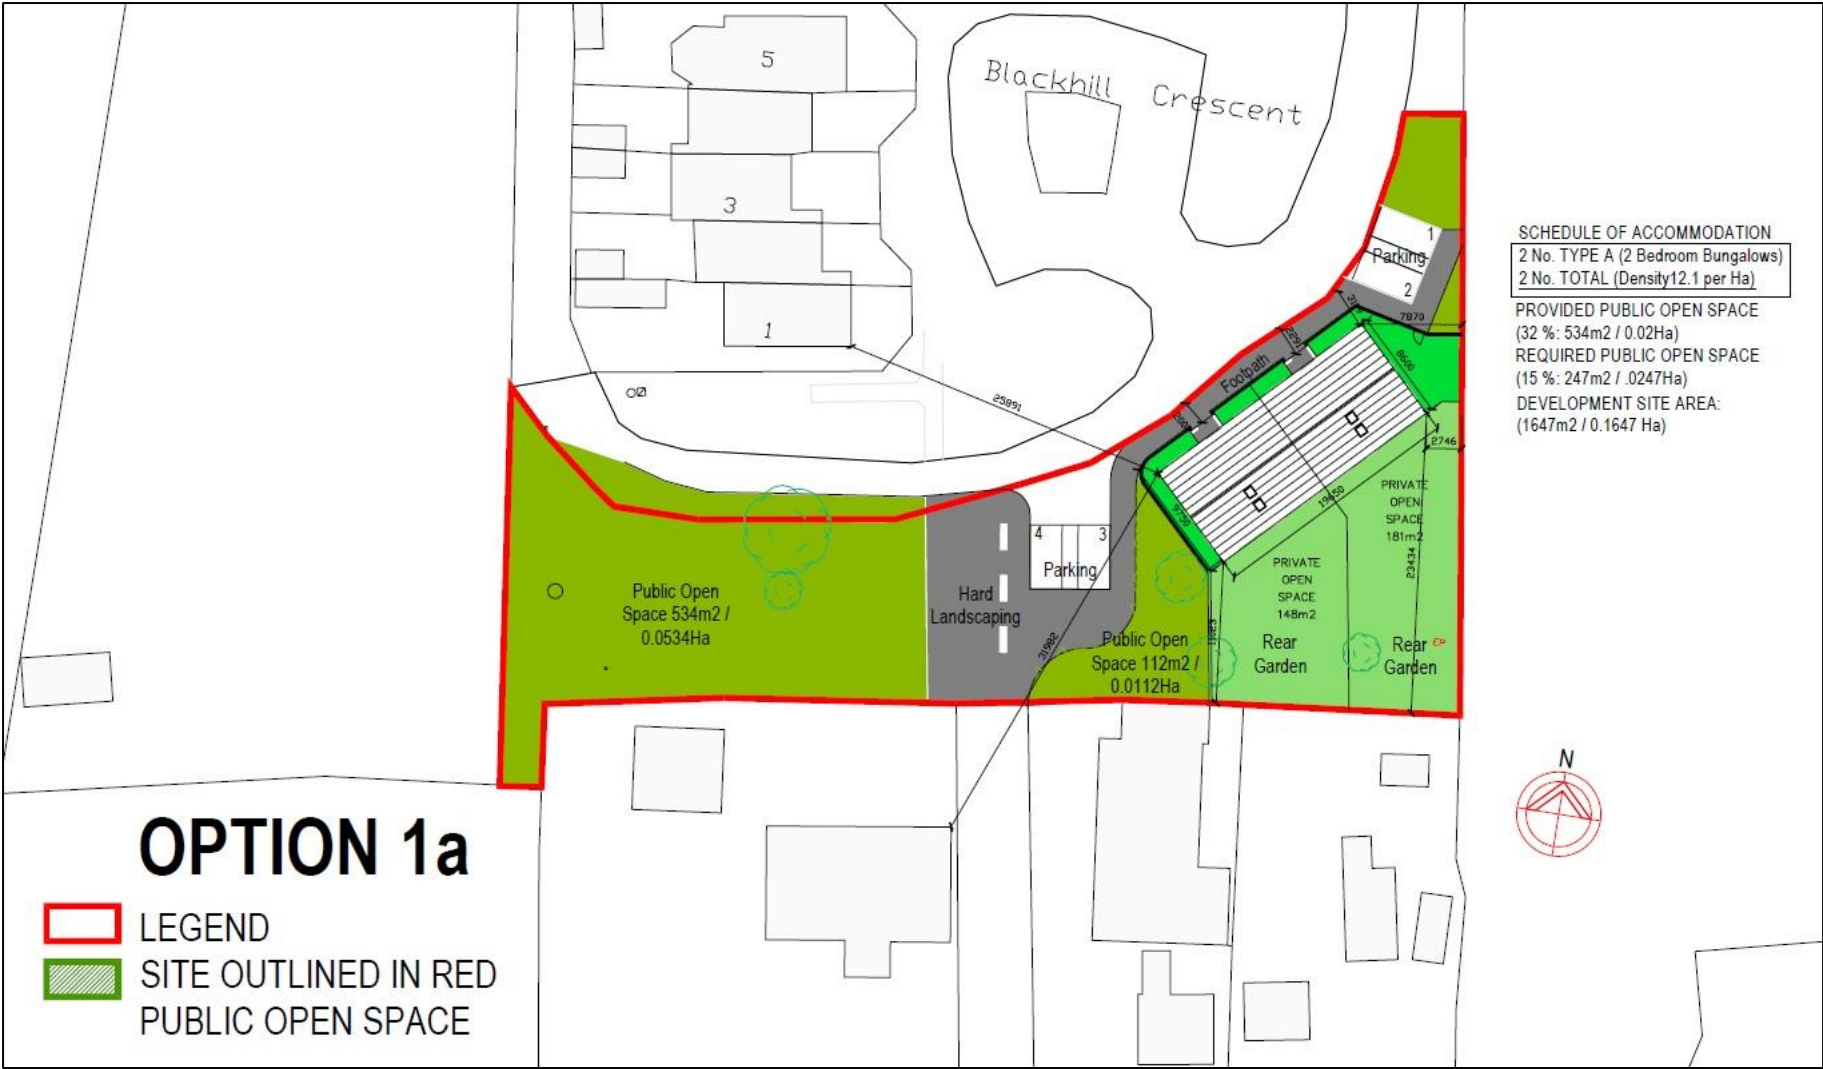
Excerpt from Architect's drawings indicating proposed layout
